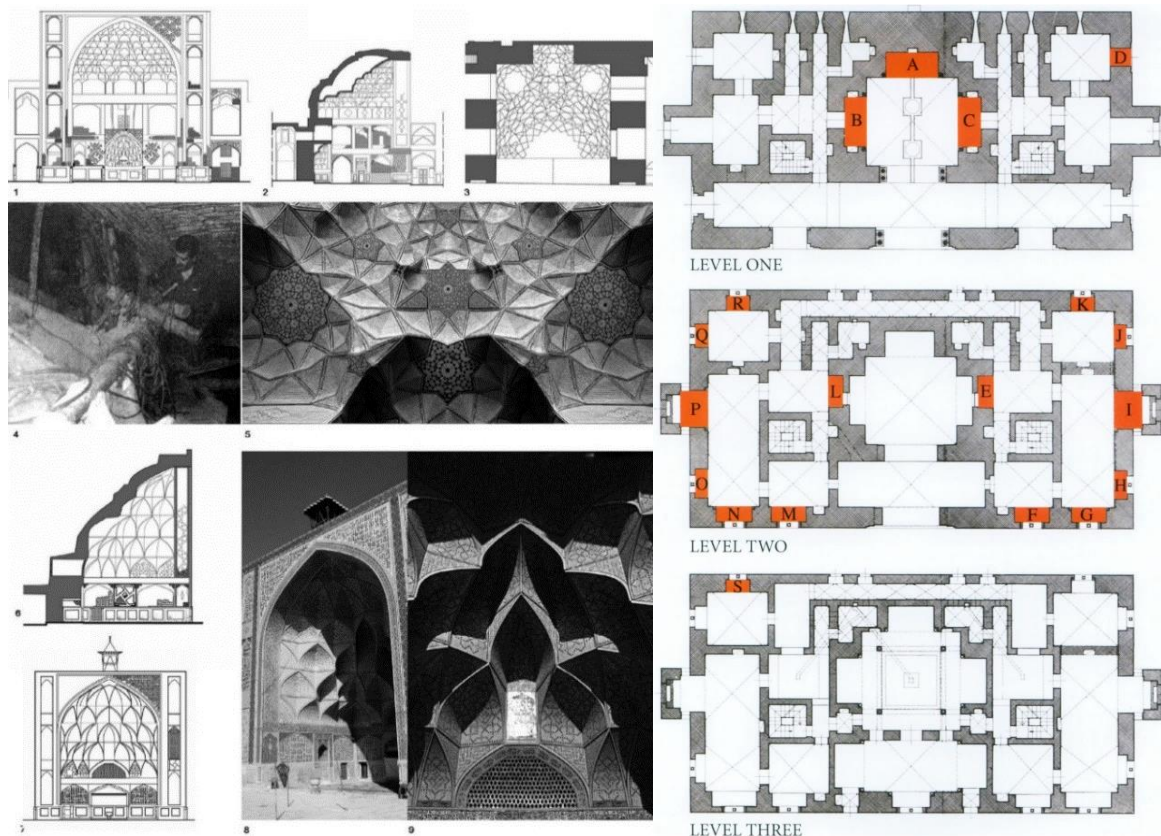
On the left: Comparing two muqarnases in the west and east iwan of the Great Mosque of Esfahan. 1,2,3. Plan, Elevation, and Section of muqarnas in the East Iwan. Muqarnas tensile elements. 5. Takht in the muqarnas of the East Iwan. 6,7,8. Plan, Elevation, and Section of muqarnas in the West Iwan of the Great Mosque of Esfahan. On the right: the location of muqarnases on the three levels of the Zisa, Palermo.
